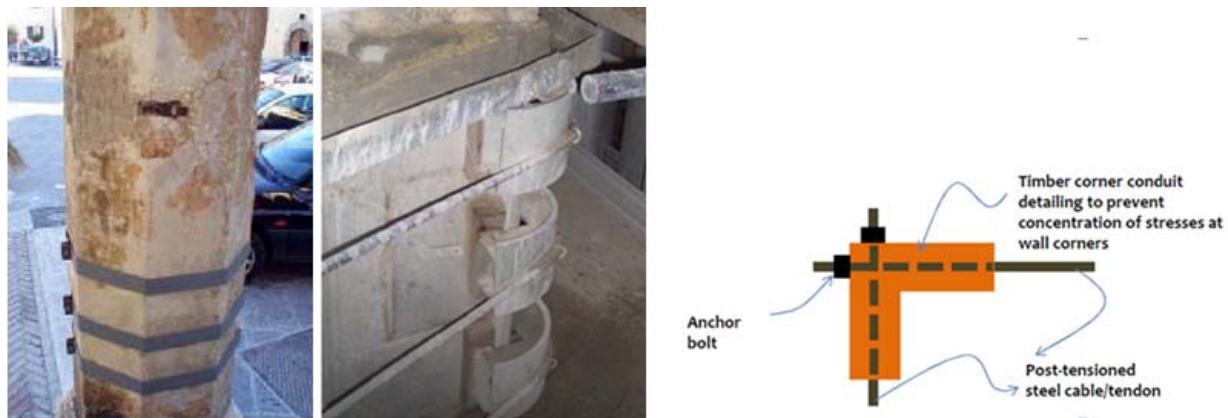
Lateral confinement with metallic belts or tendons and detailing at the corner
